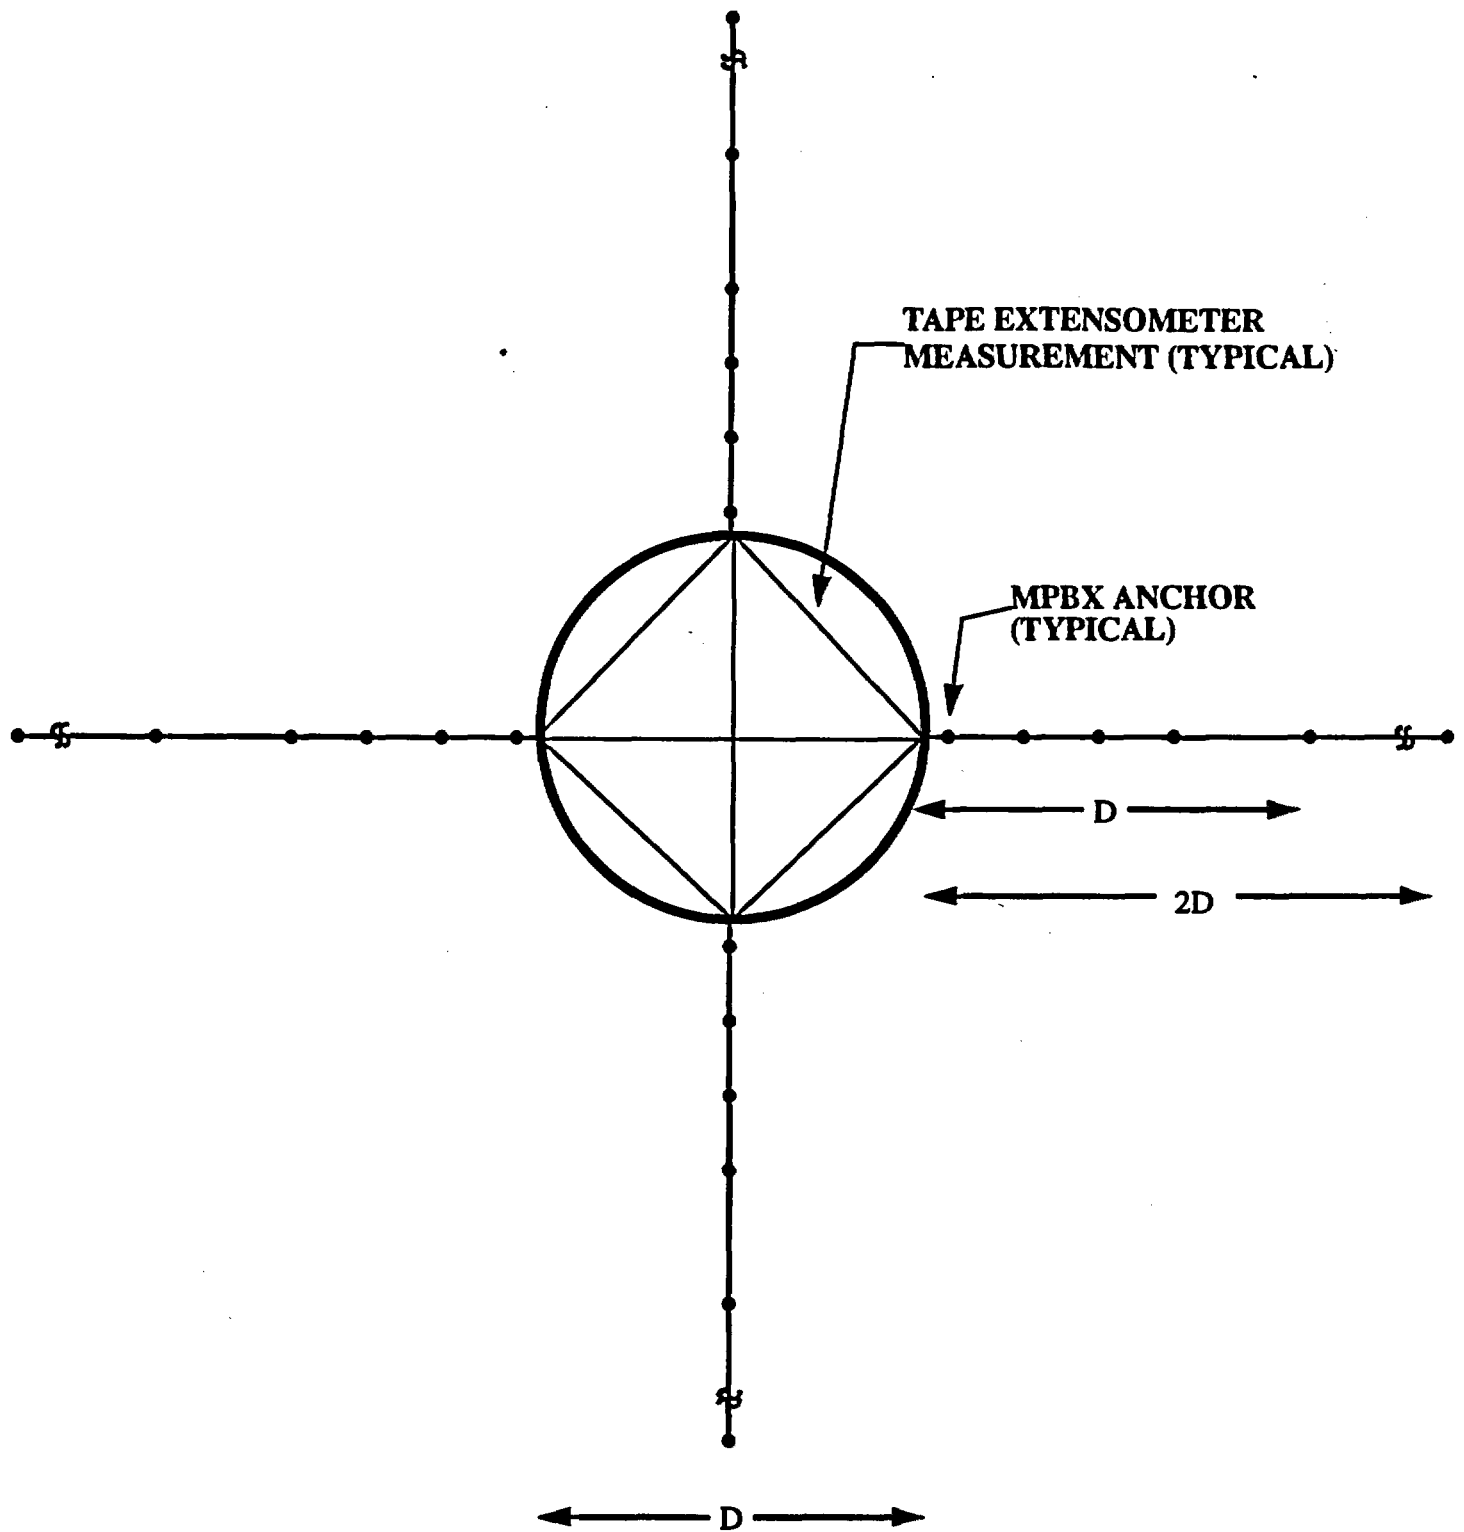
Typical Configuration of Multi-Point Borehole Extensometer (MPBX) Instrument Station
